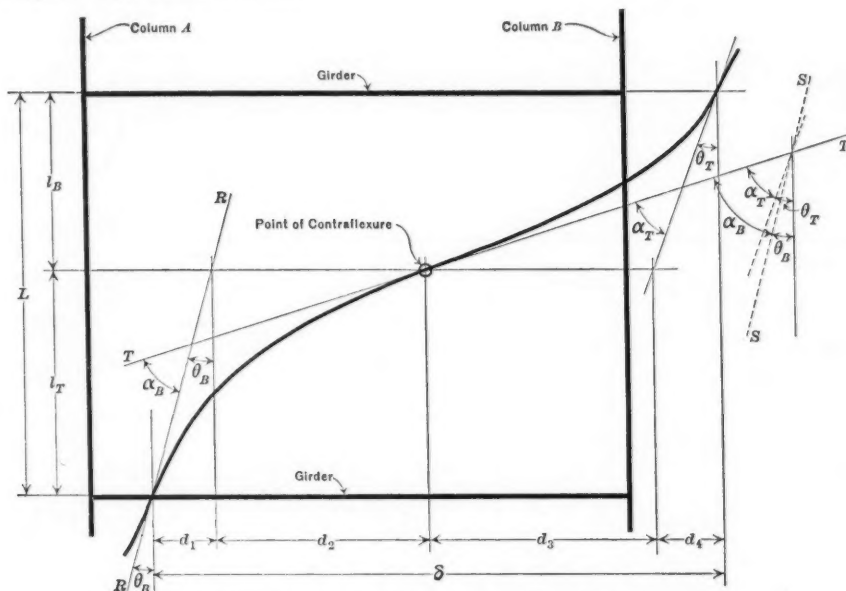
DEFLECTION IN STORY DUE TO COLUMN MOVEMENT.
